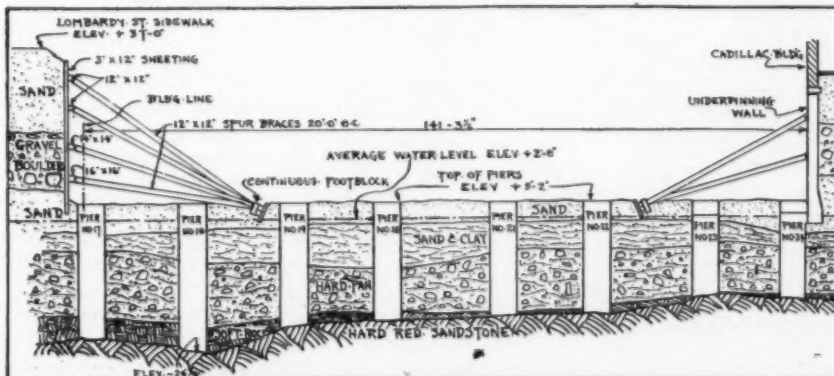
Cross Section Through Lot Showing Soil and Rock Conditions and Shoring of Banks
